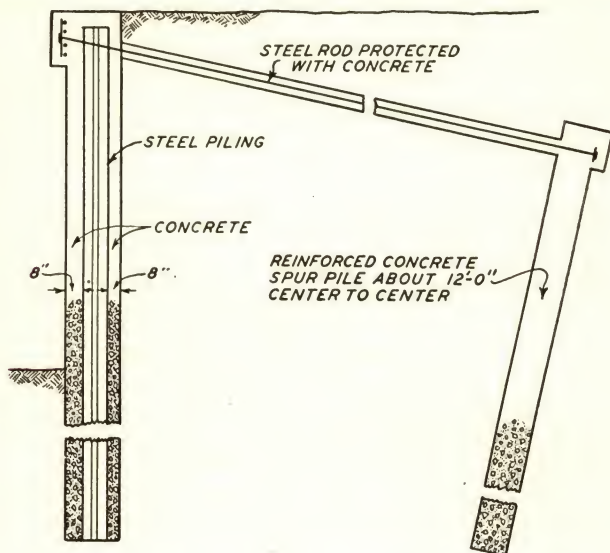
Retaining Wall of Arch Web Steel Sheet Piling Tied Back at Top
